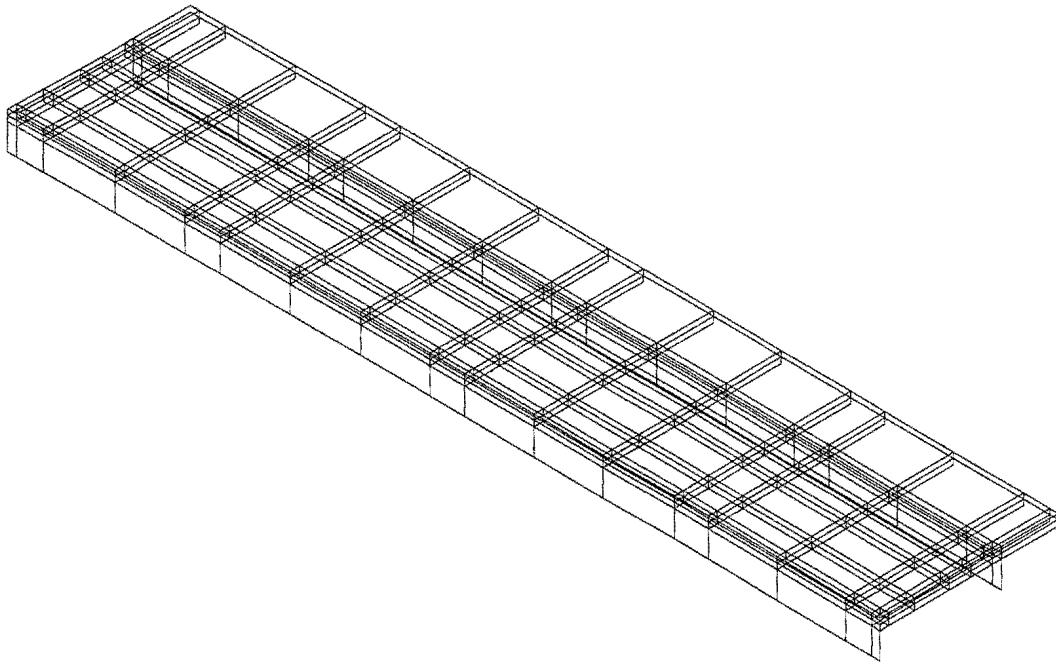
Finite element model for full-size, 50 foot-span (15.24-m) highway bridge. Only half of the bridge is modeled due to symmetry
